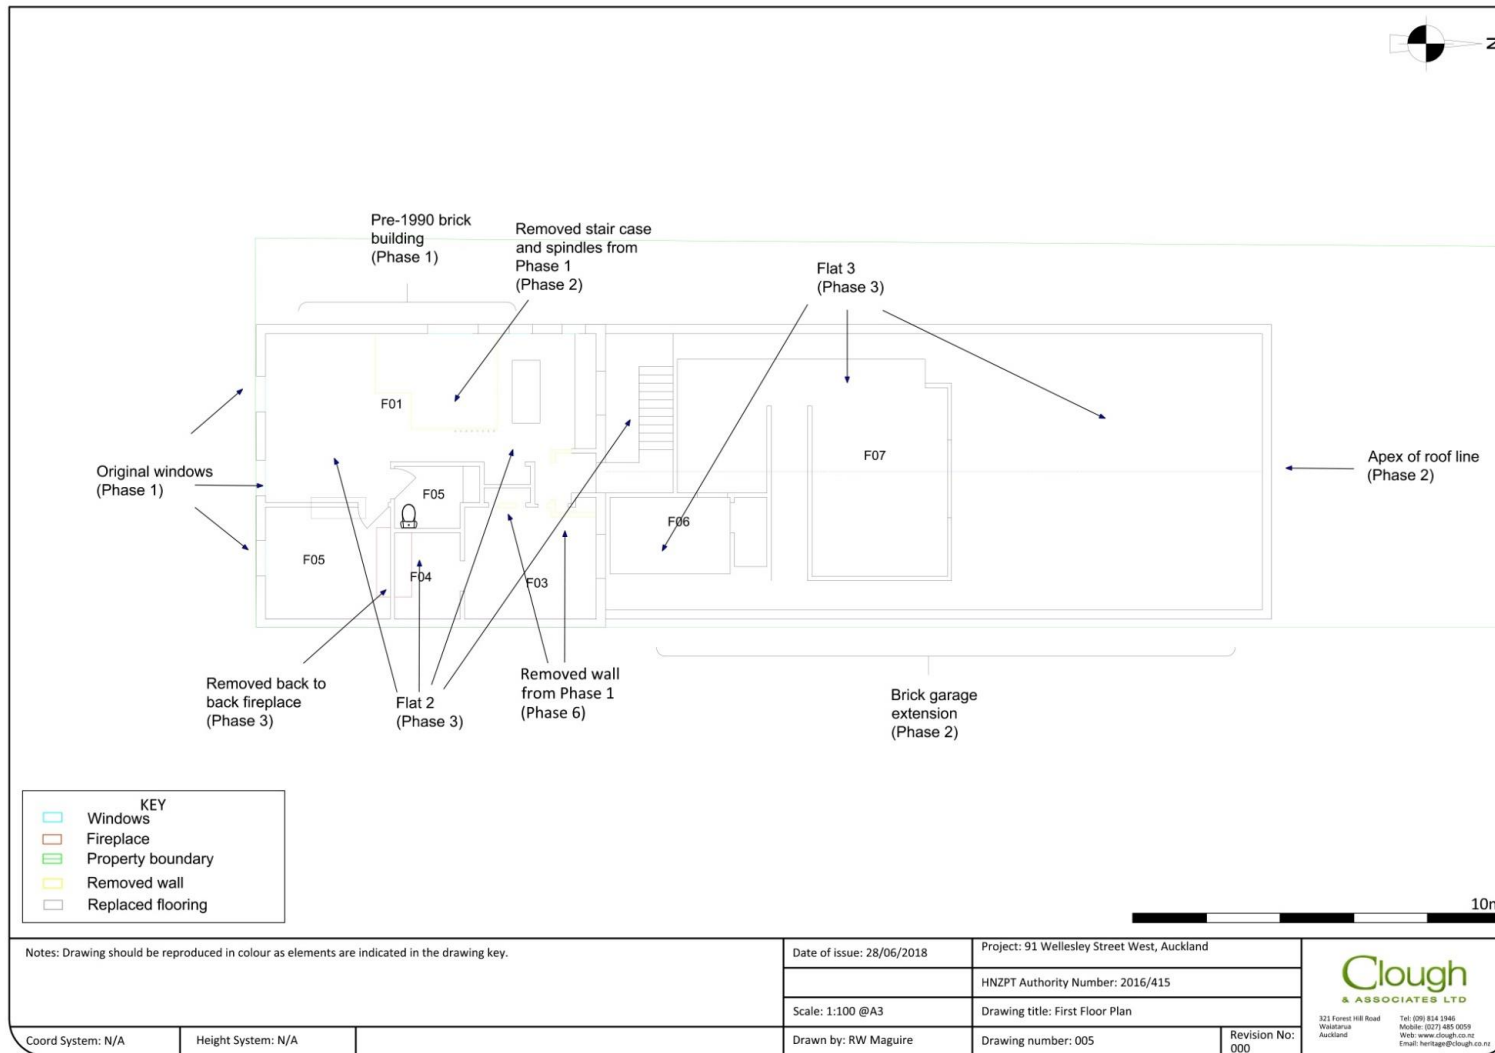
First floor plan of 83 Wellesley Street West (source: Clough & Associates, 2018)
